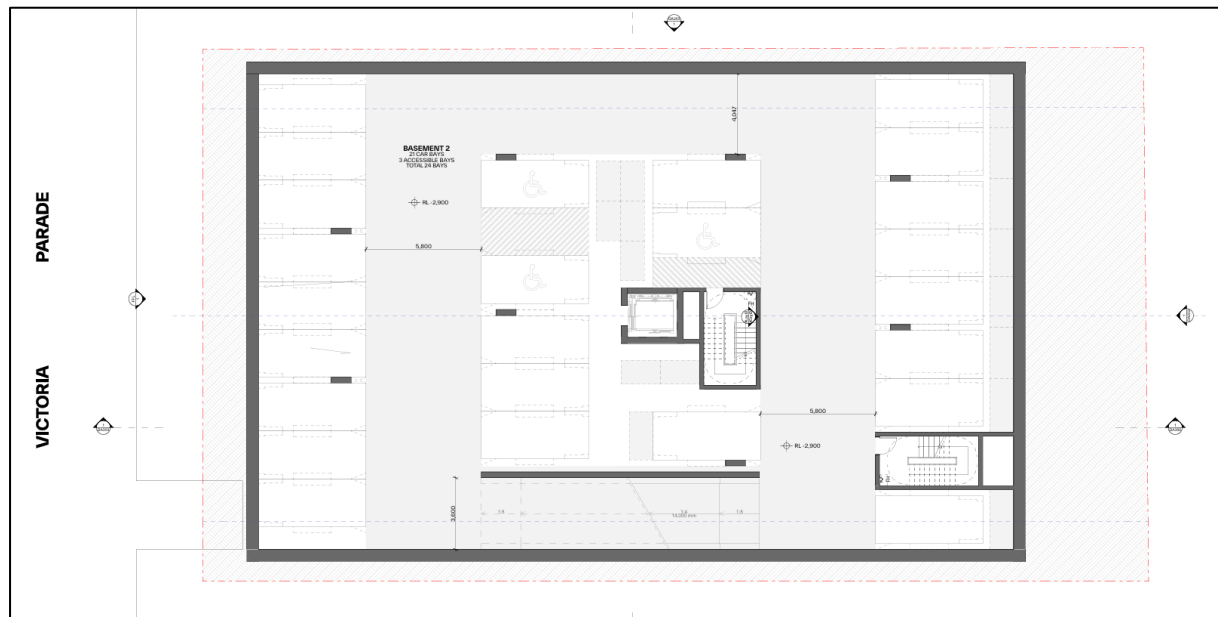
Floor Plan for Basement 2 (Source: PBD Architects, 2026)
